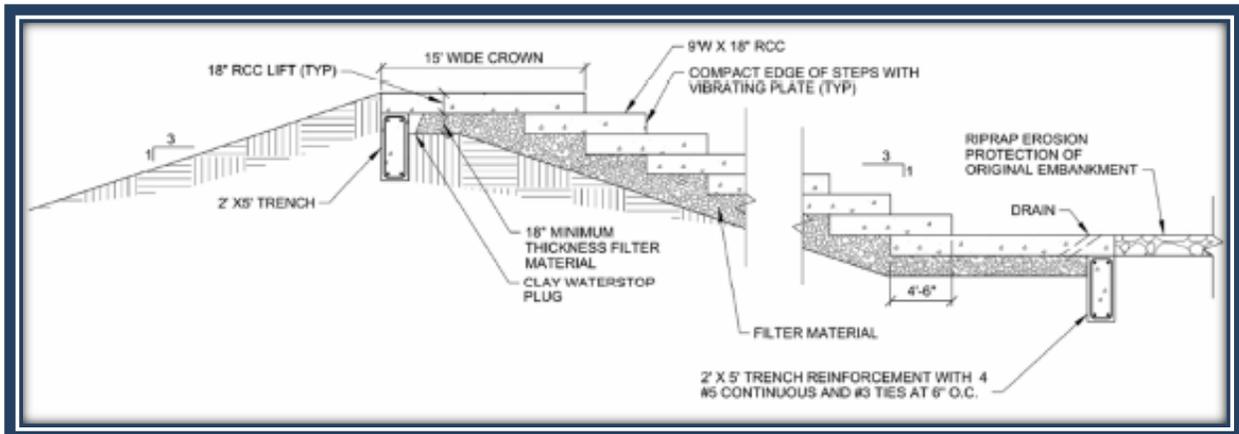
Typical Cross-Section for Stepped Roller Compacted Concrete
